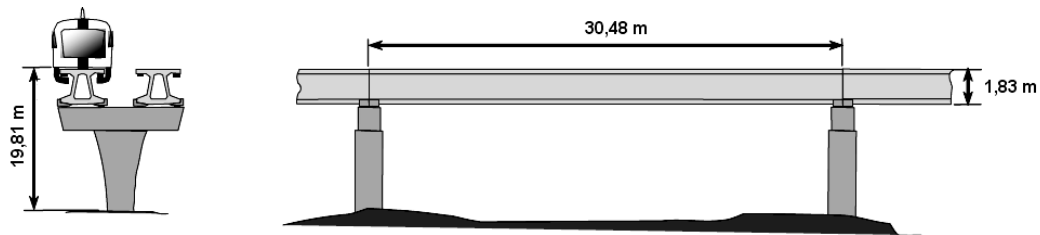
Elevated-guideway configuration: Type A - single column [7]
